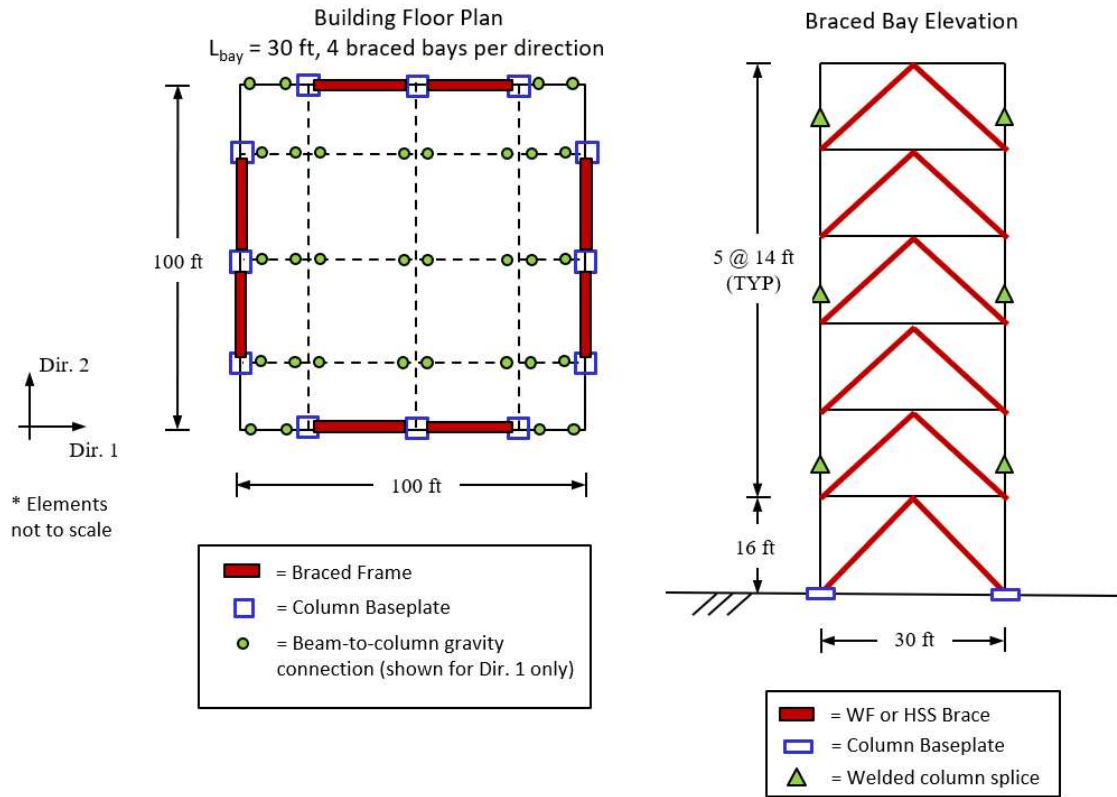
Illustration of (a) plan layout and (b) braced frame bay elevation for SCBF archetypes, showing the typical population of structural components.
